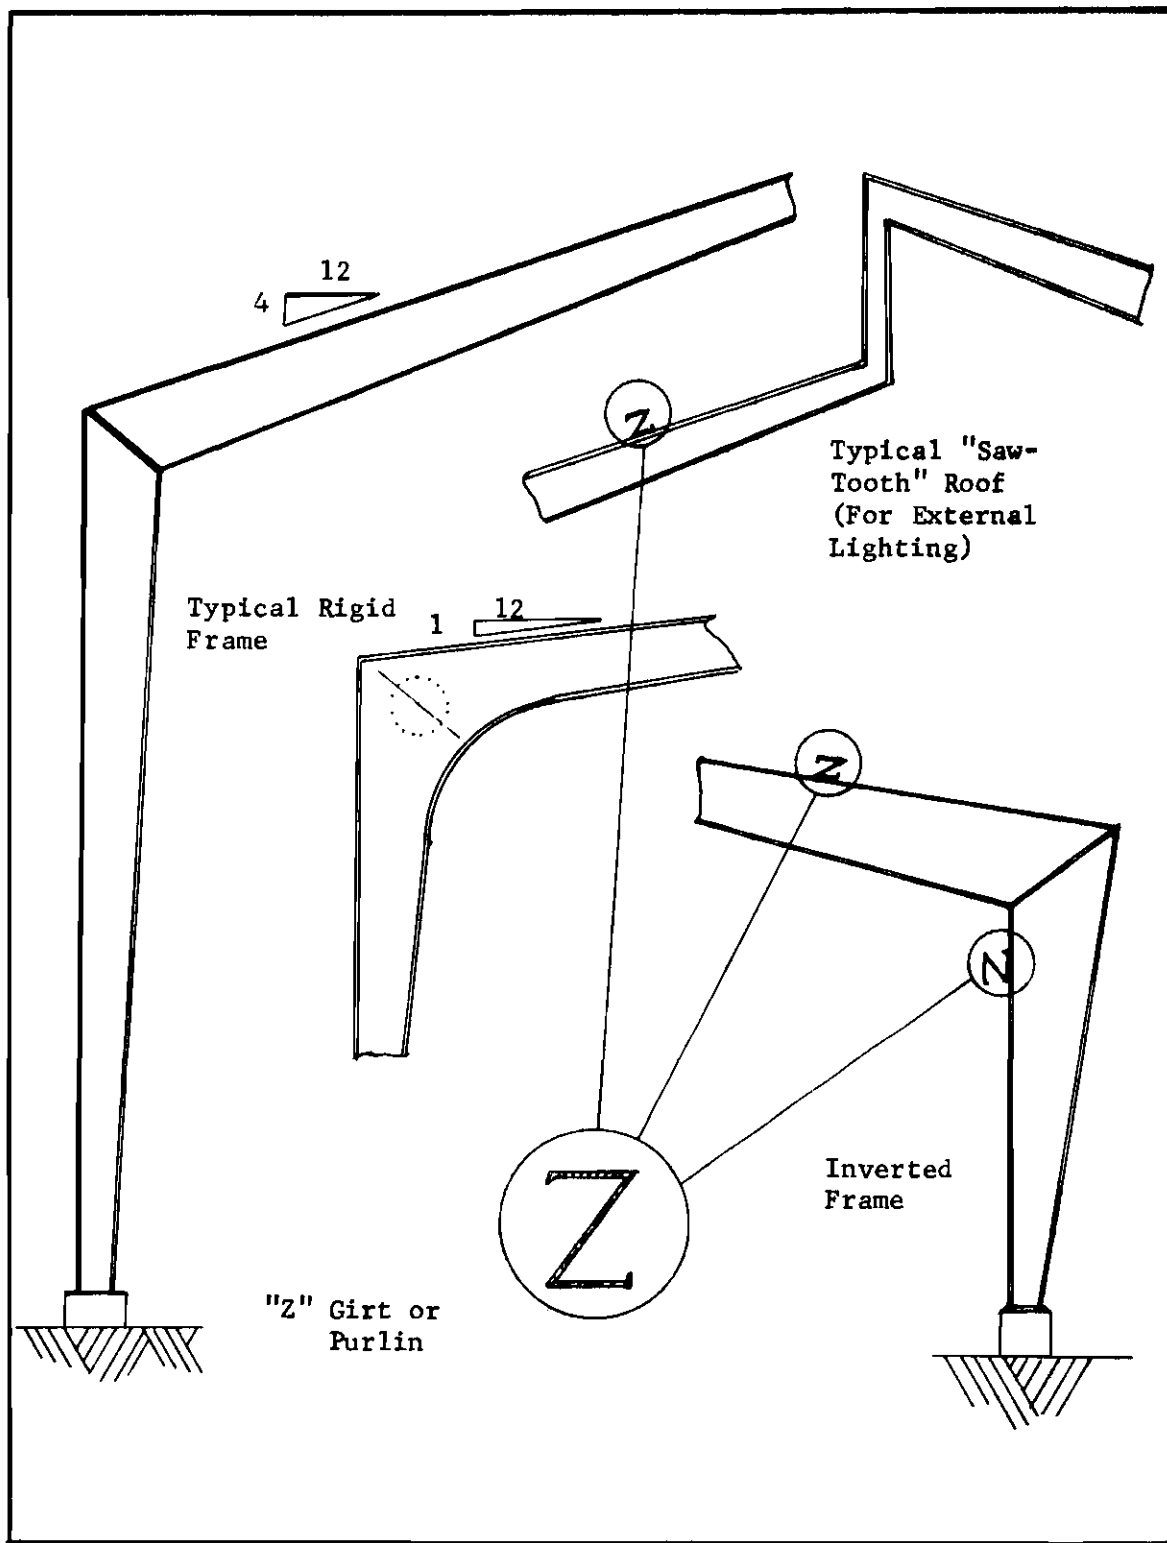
Typical Structural Members for Pre-Engineered Buildings
